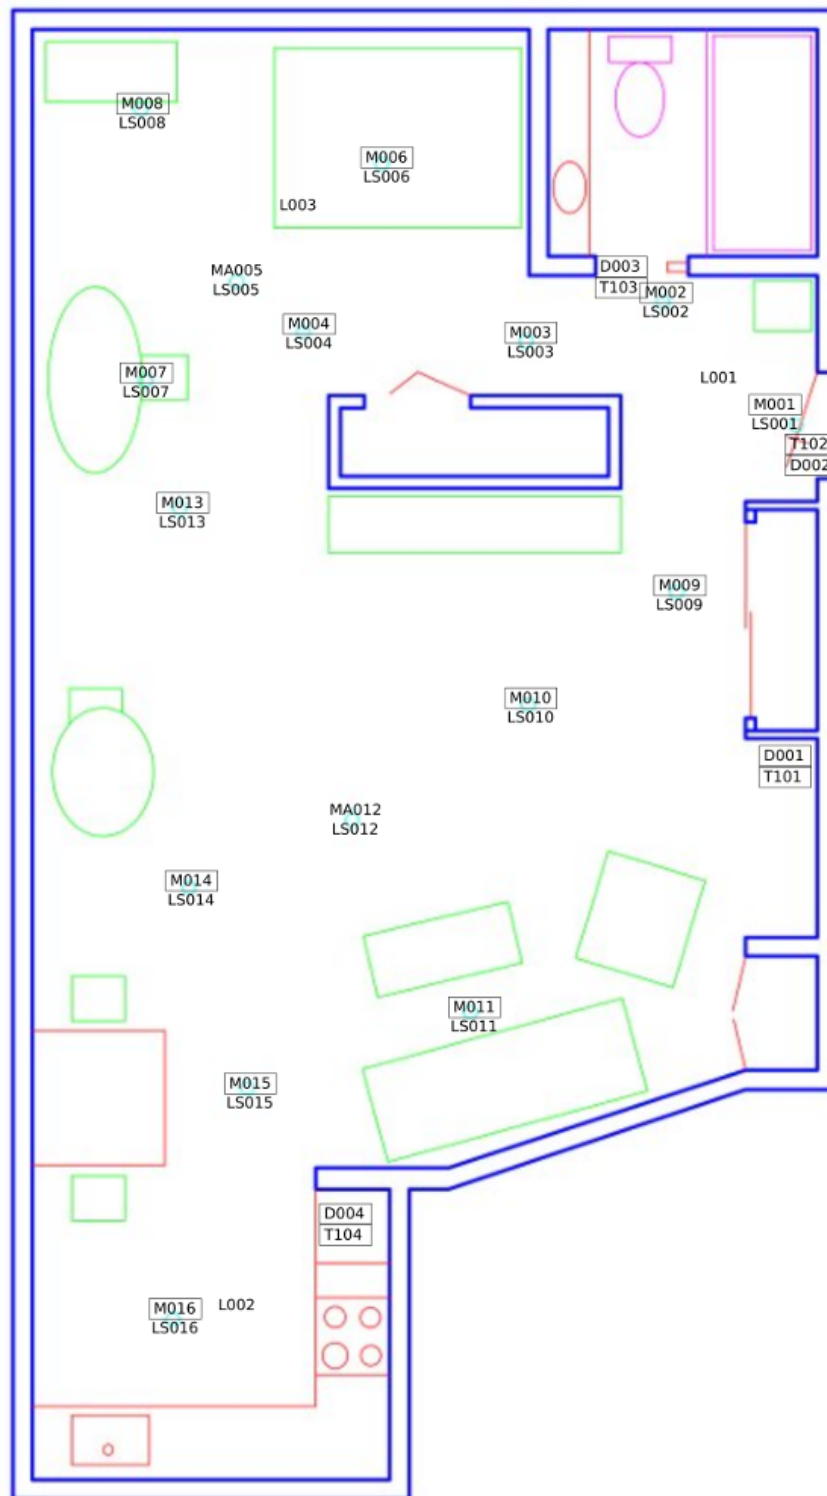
Floor plan and sensor placement for the testbed hh112.
